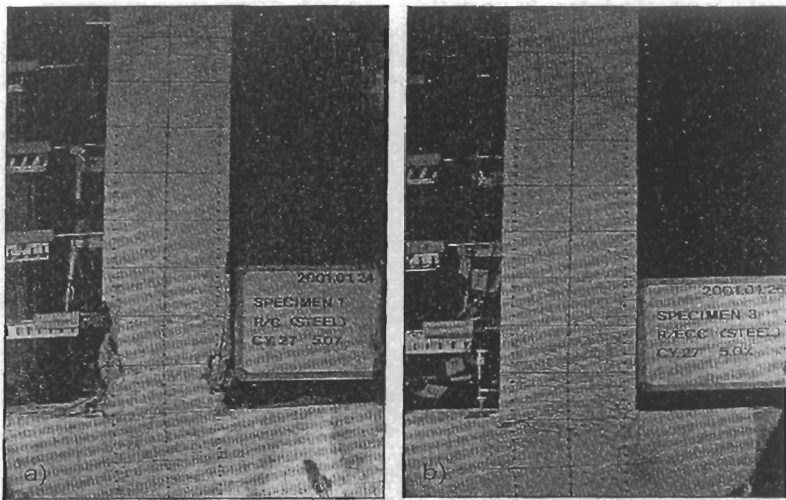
Deformed shape of a) S-1 and b) S-3, both with steel reinforcement
